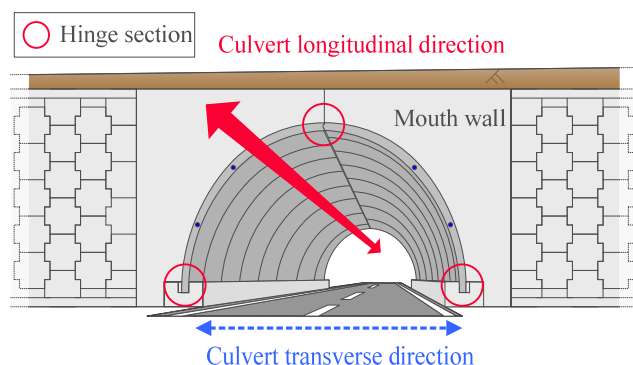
Three-hinge-type precast arch culverts installed in embankment
